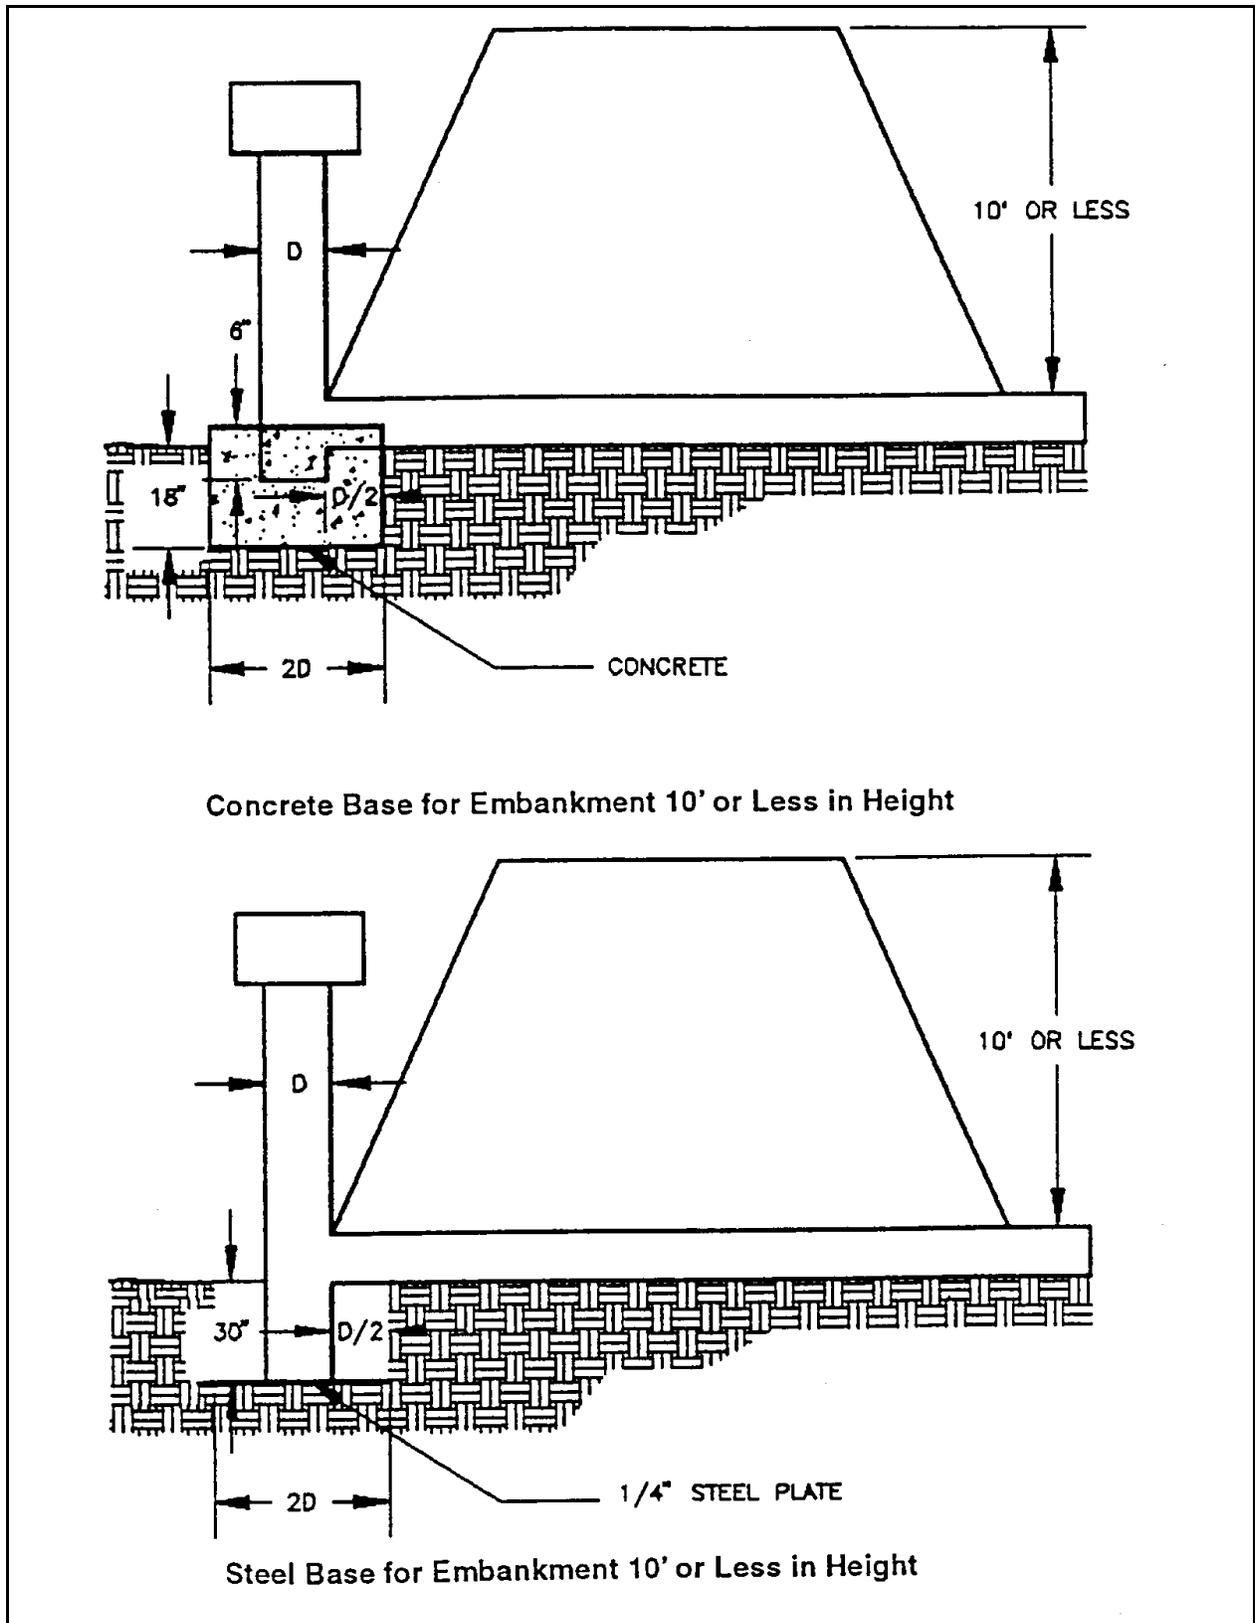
Riser Pipe Base Conditions for Embankments Less than 10 Feet High
